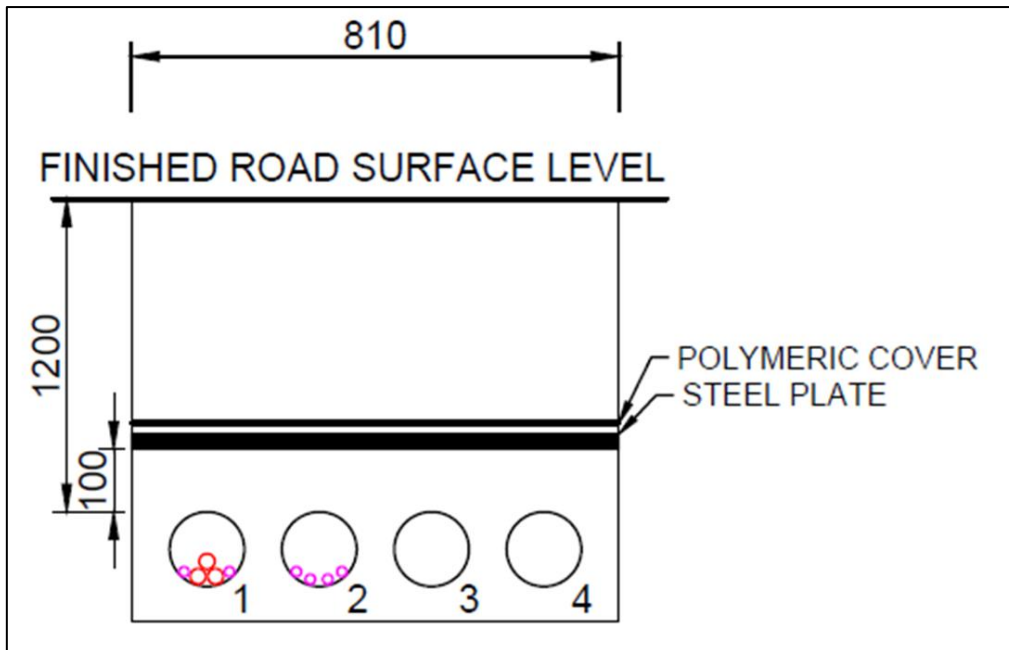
Indicative elevation of cable trench. The maximum depth approximately 1400mm.
